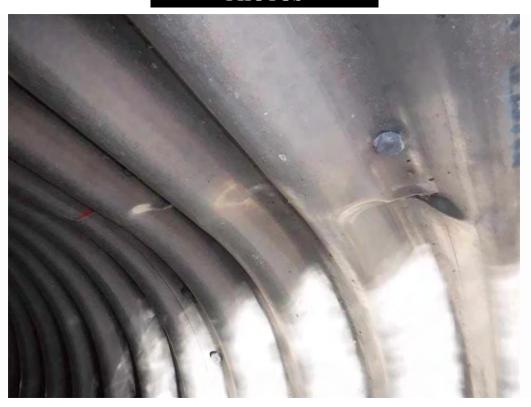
Barrel 1, 5'-0" Long Deformation Starting 10' away from the South Headwall and 2' East of the Crown
